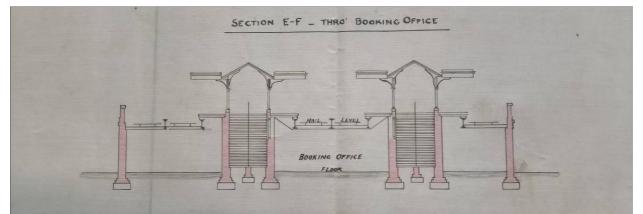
1894 section by Charles Foreman through booking hall and platform buildings.⁶⁷
